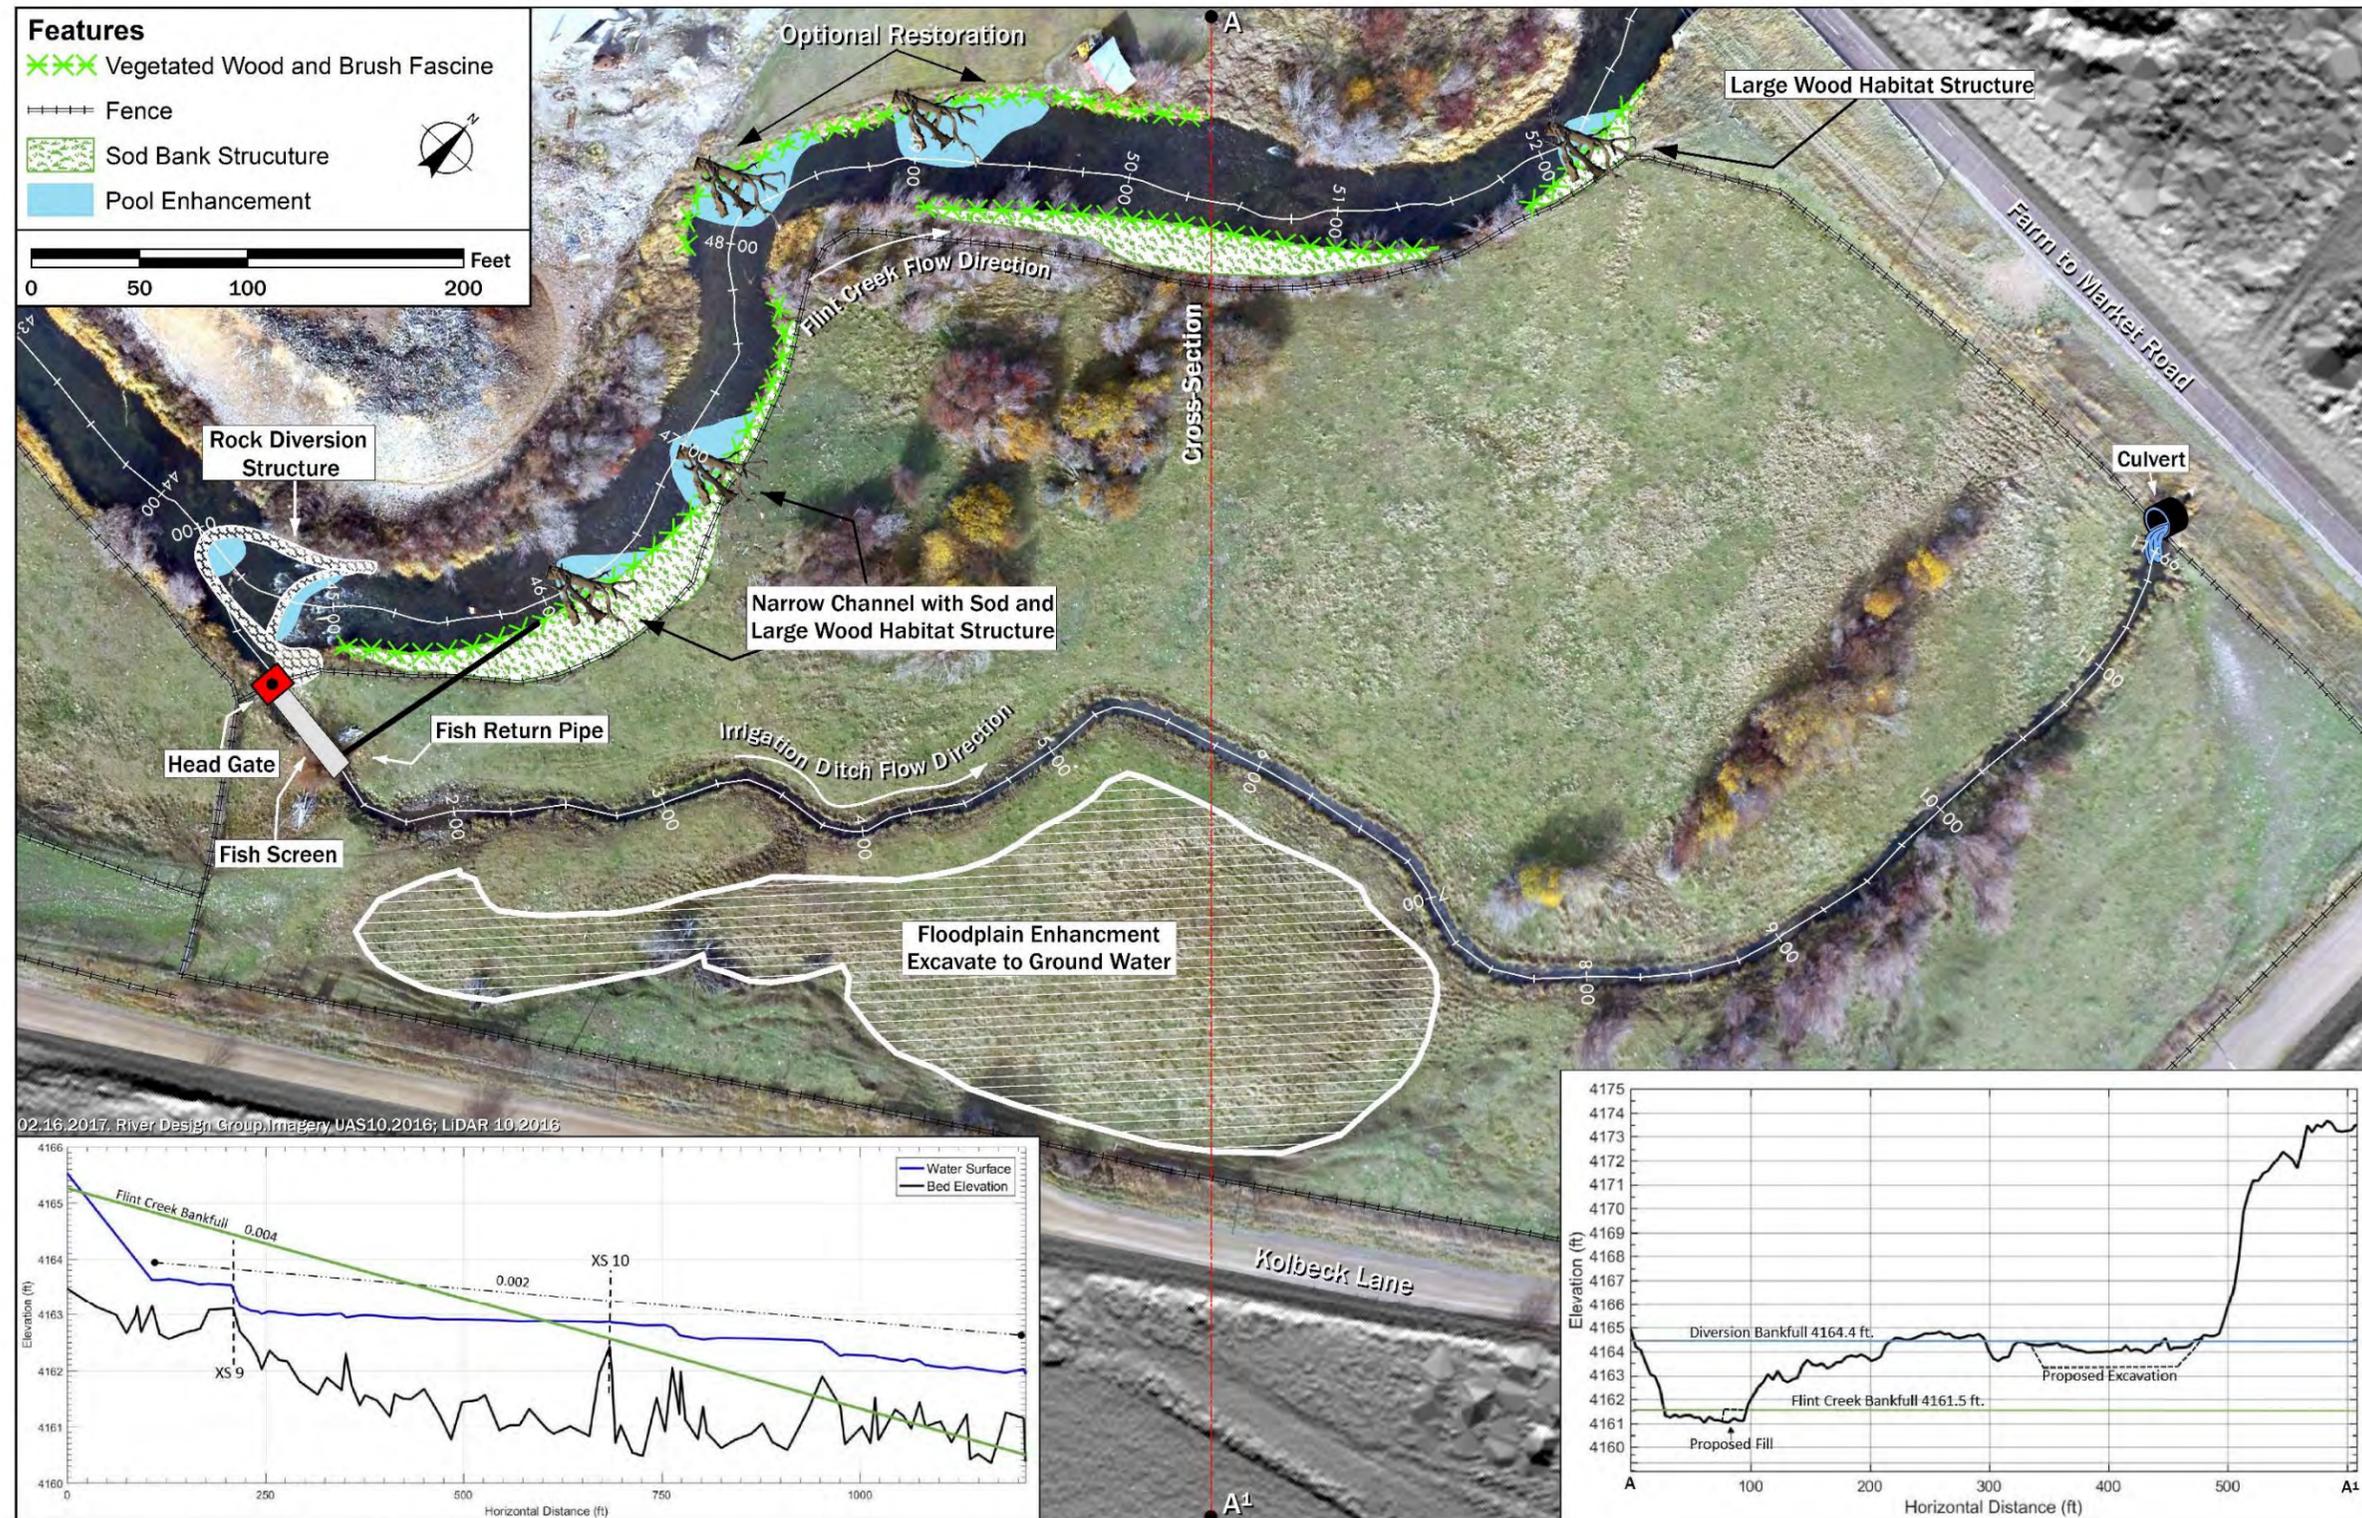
Conceptual irrigation diversion plan and conceptual design for the fish screen and lower project site on Flint Creek.
